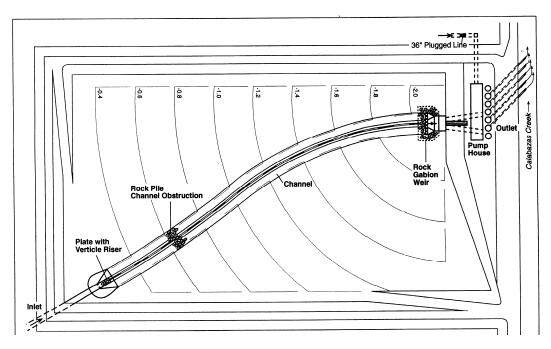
Sunnyvale Pump Station No. 2 dry detention pond.
